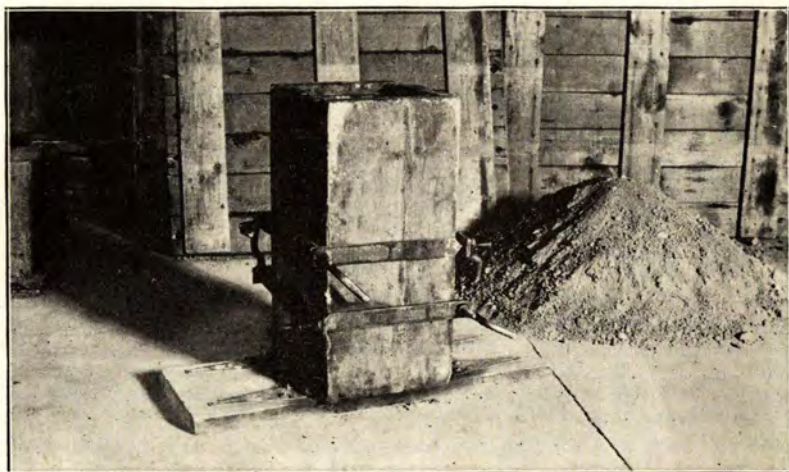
FORM USED FOR MAKING RAMMED EARTH TEST PIECES.
